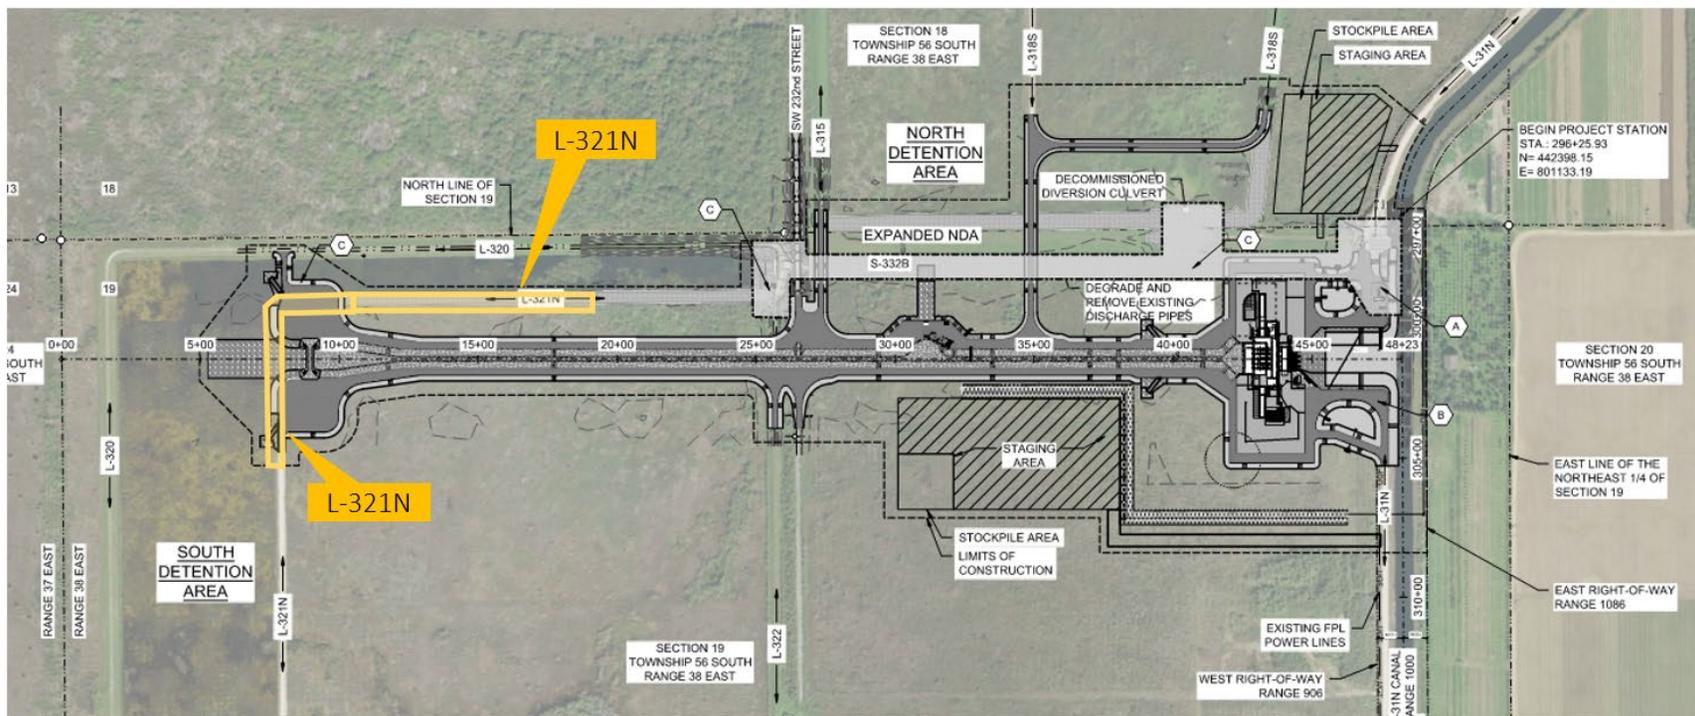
S-332B Replacement Pump Station: Additional Levee Modifications Due to Implementation of Alternative 2
